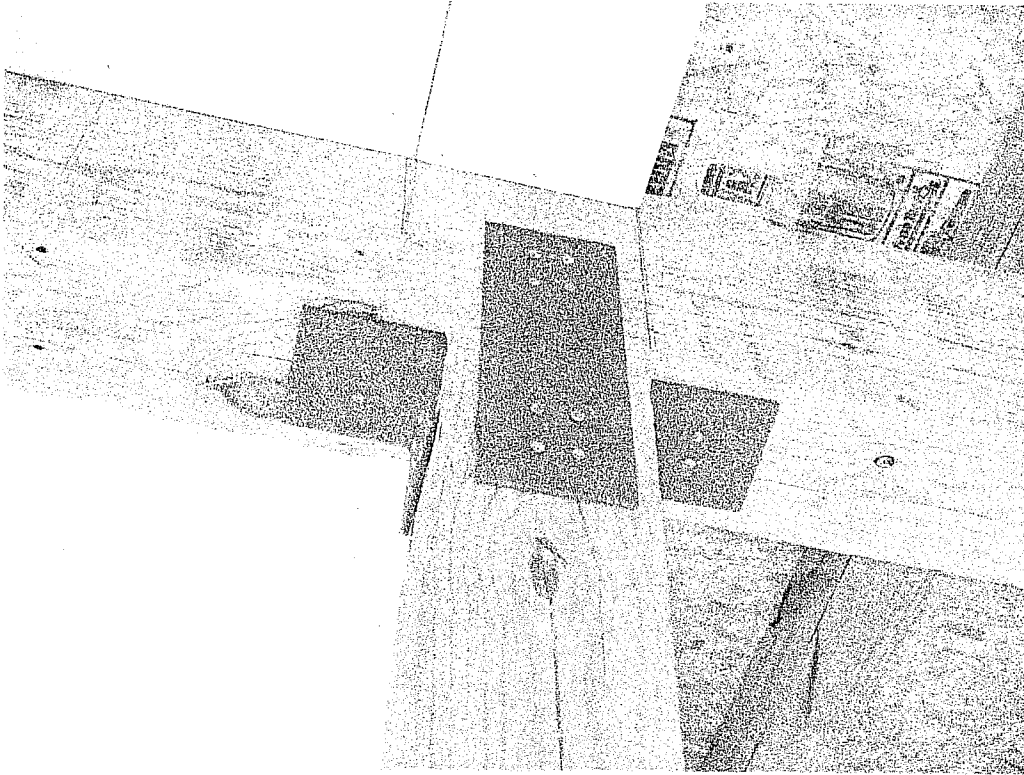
Existing column was too short at porch located at grid line 8/G –note column extension.
